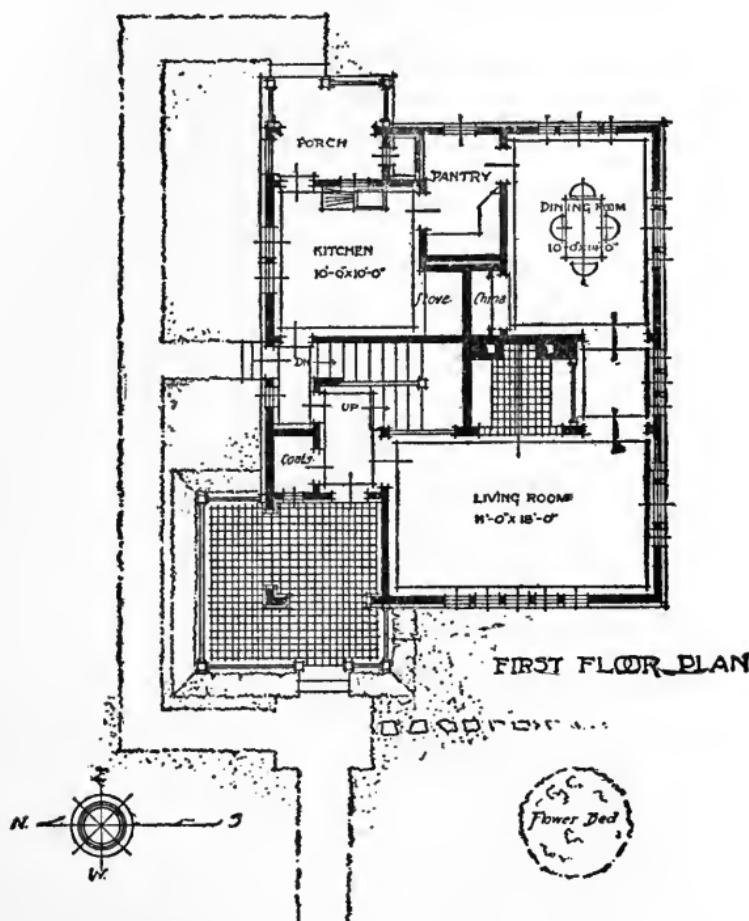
First Floor Plan of a \$5,000 house, by C. M. Craig, Architect.
